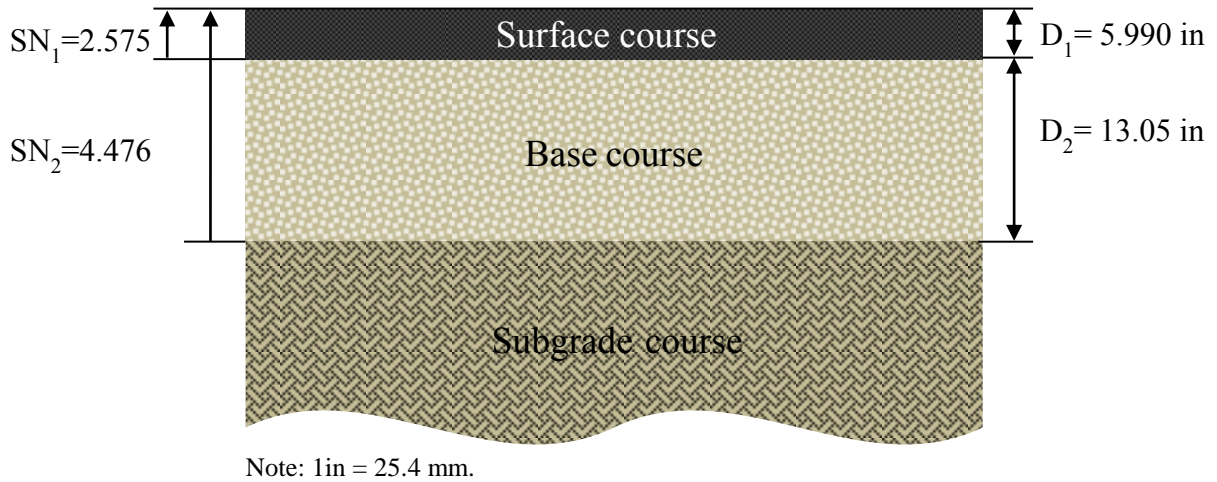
The design of 12% uphill flexible pavement layers.
